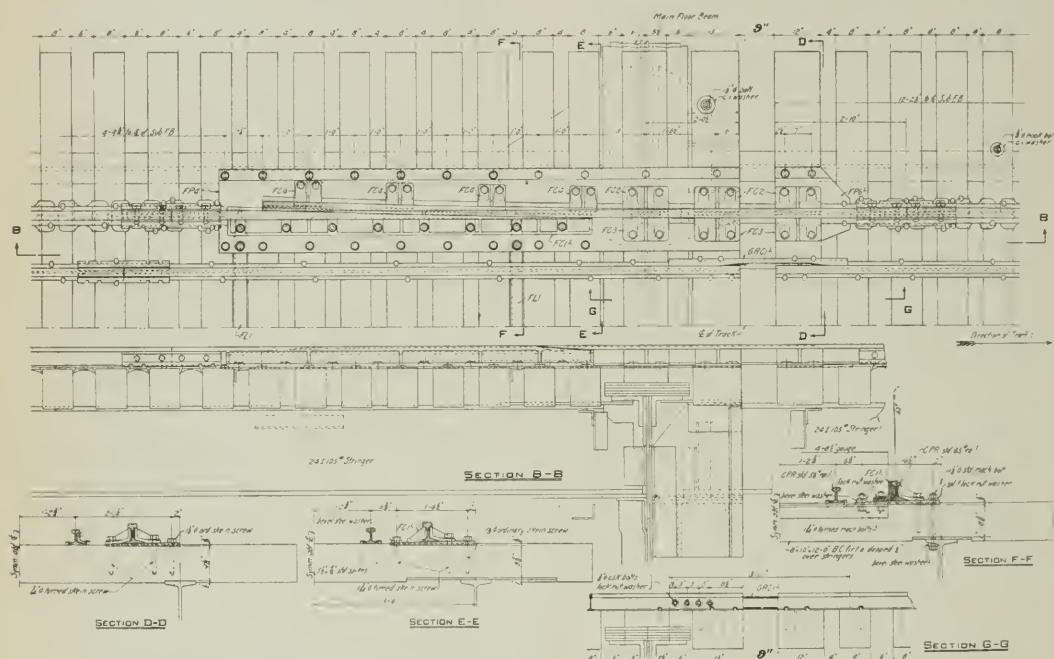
Main Rail Expansion Joint Provided in Floor System at Ends of Cantilever and Anchor Arms
